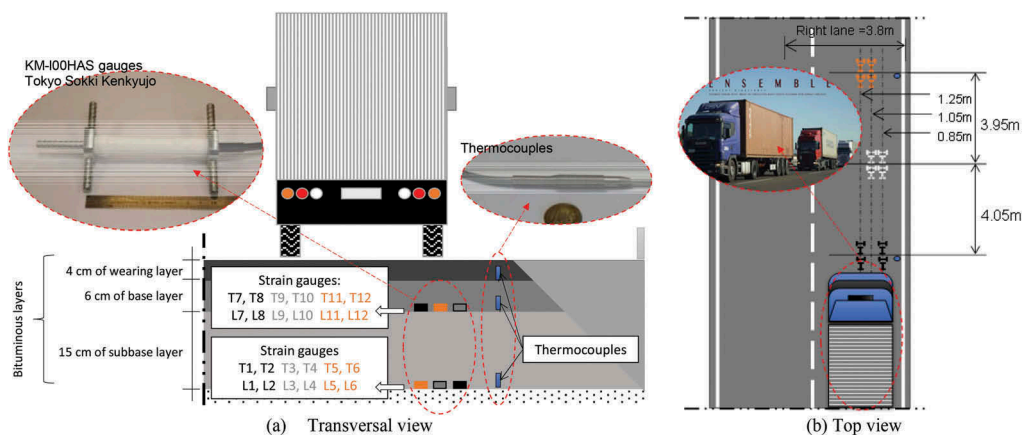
Pavement structure and instrumentation (the images are not to scale).
